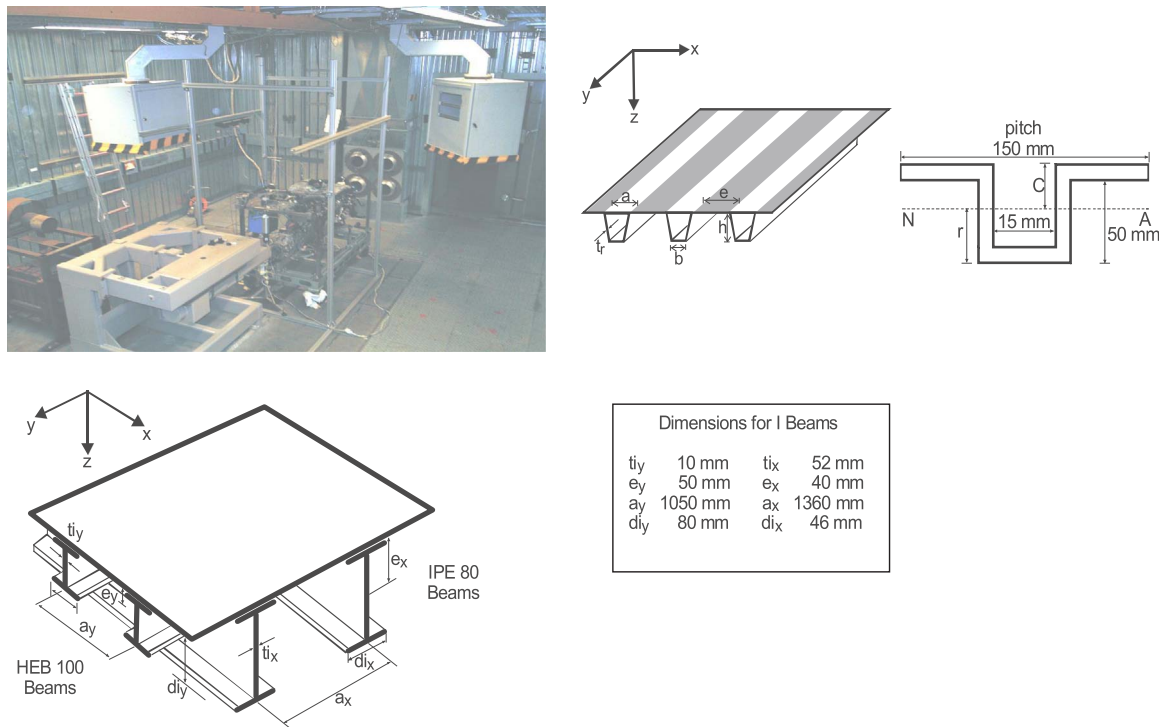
Hydrogen Combustion Test Chamber and Typical Left Wall Frame Structural Details with IPE 80 and HEB 100 beams and 3 mm Outer Steel Plate Cover.
